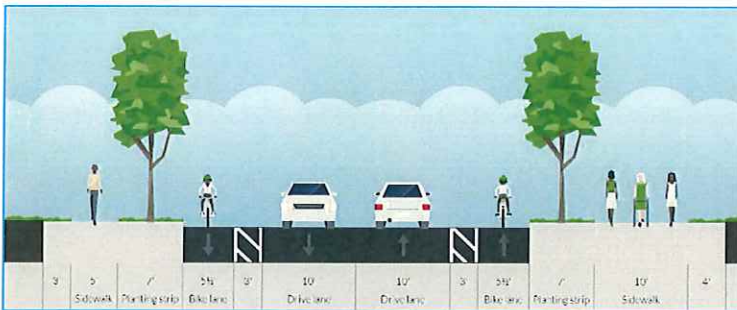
Proposed Typical Cross Section for Evergreen Dr
